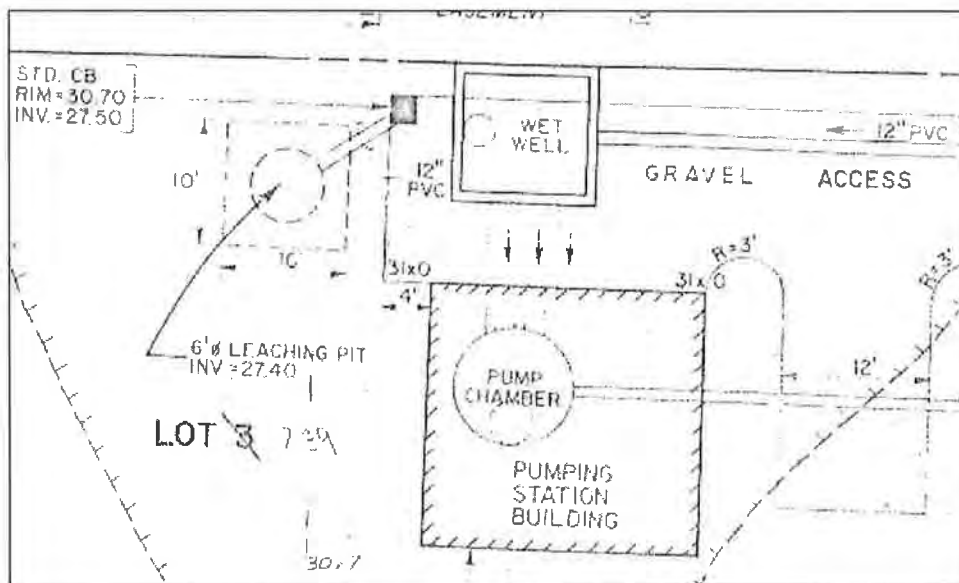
Plan view of South Valley Pumping Station site layout illustrating connections between the wet well and dry well.
